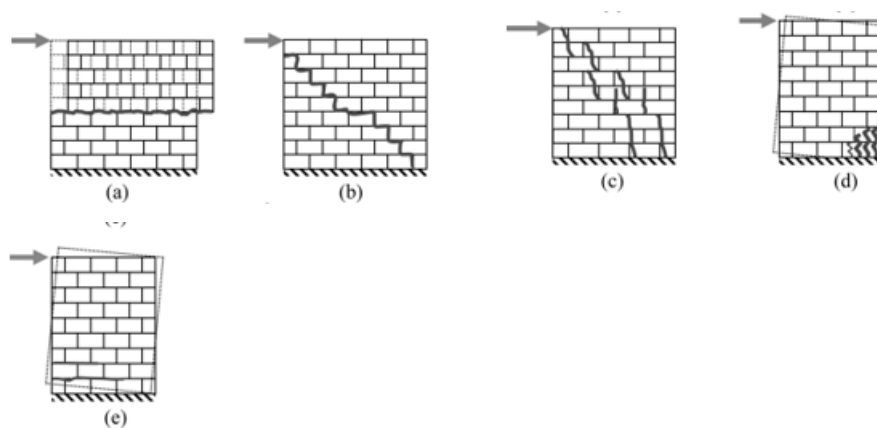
Masonry failure mechanisms: Shear failure (a, b, c); Compression failure (d); Tension failure (e) (Jovanoska & Churilov, 2009)
